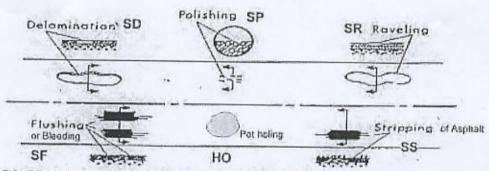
SURFACE DISTRESS OF FLEXIBLE PAVEMENTS
